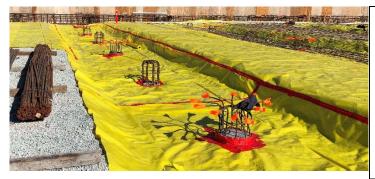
Example of an impermeable liner placed and sealed at a building for soil gas control.
